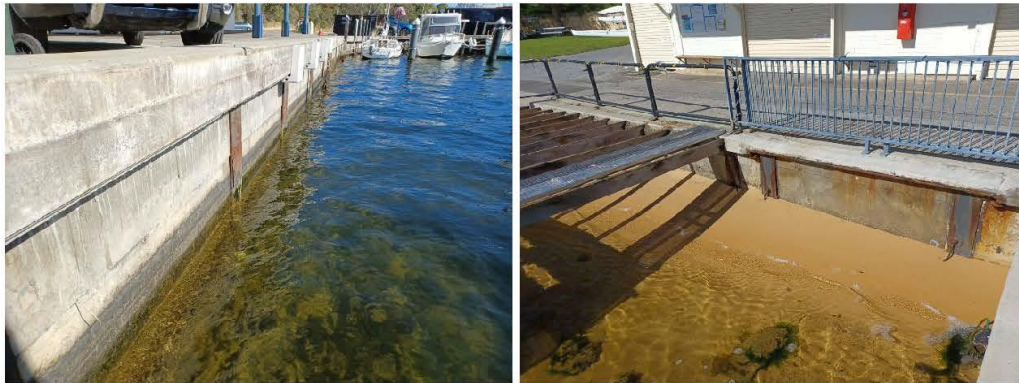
Concrete Panel & Steel H-Pile Wall
